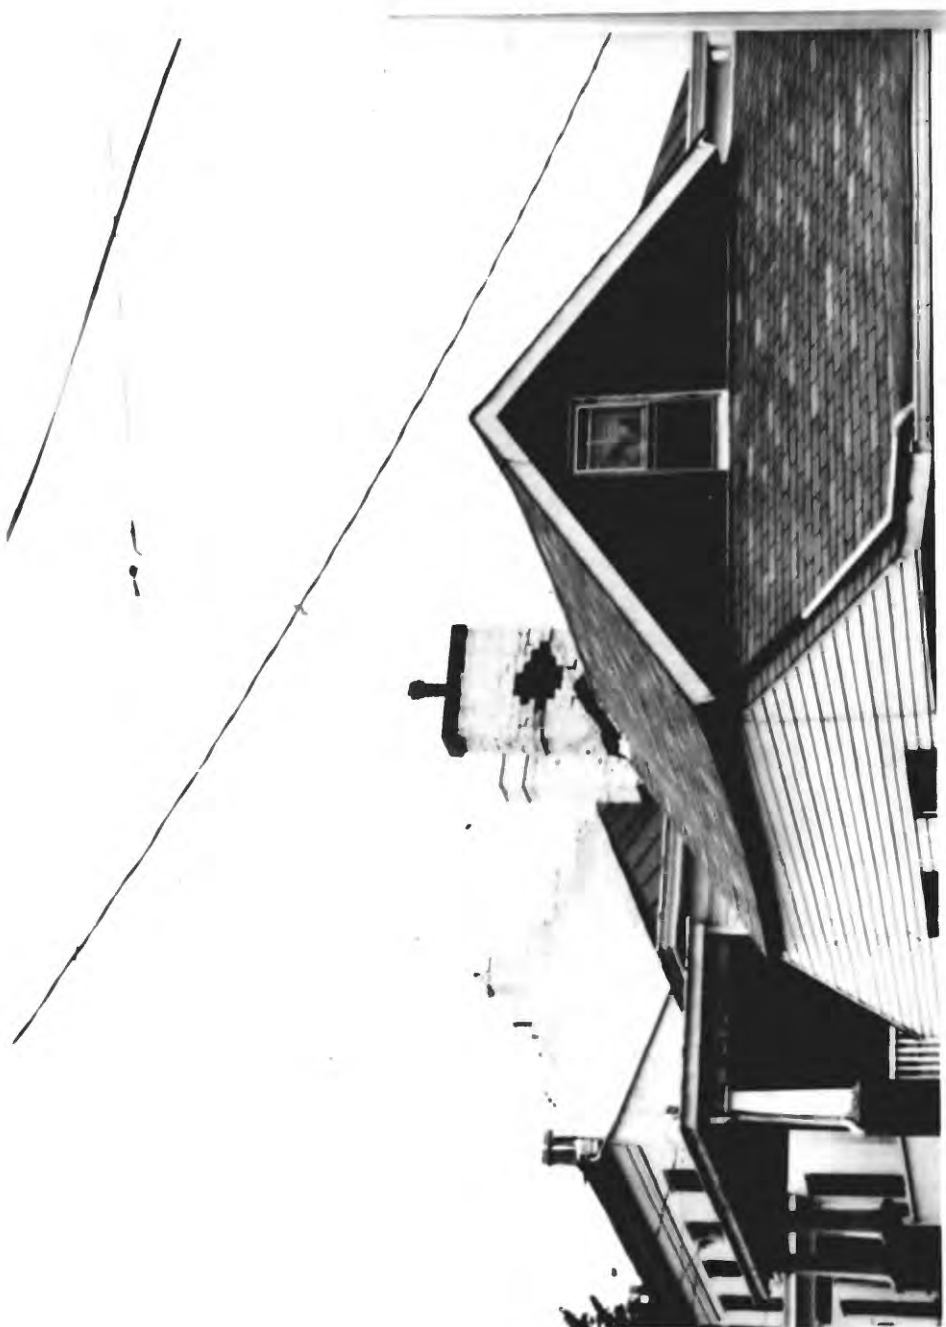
Bricks knocked out of middle of chimney. Parapet damage to building in background in Maysville, Kentucky (photo by G. A. Bollinger).
